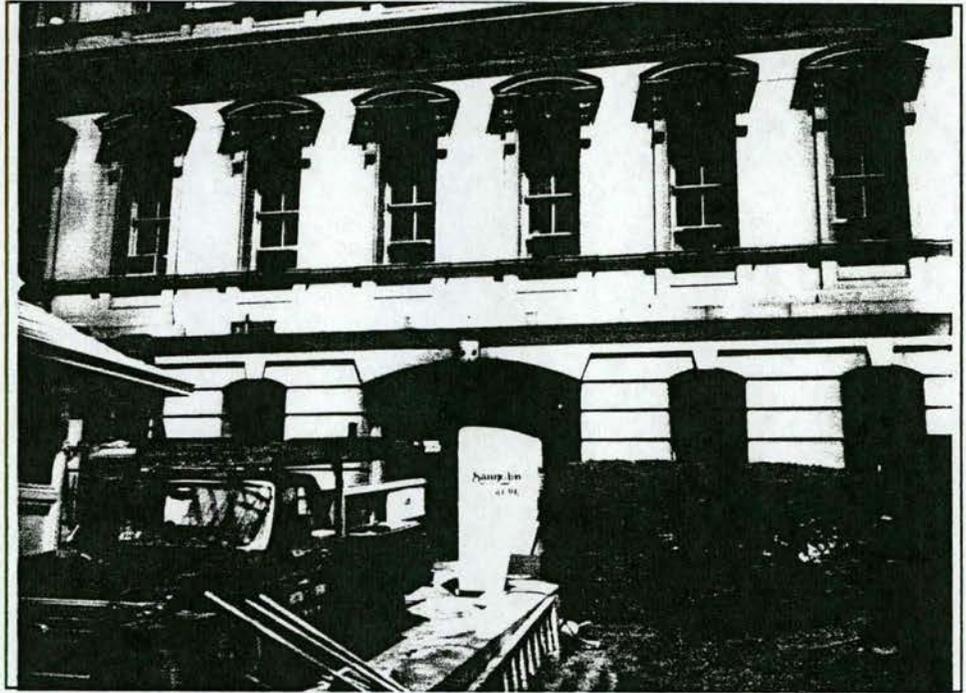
View of southern carriageway, west elevation with adjacent new construction of guard post. Note stained mortar joints and stone along protruding belt course immediately above carriageway. Also note condensate water from window air conditioning unit flowing over belt course above window left of carriageway.
